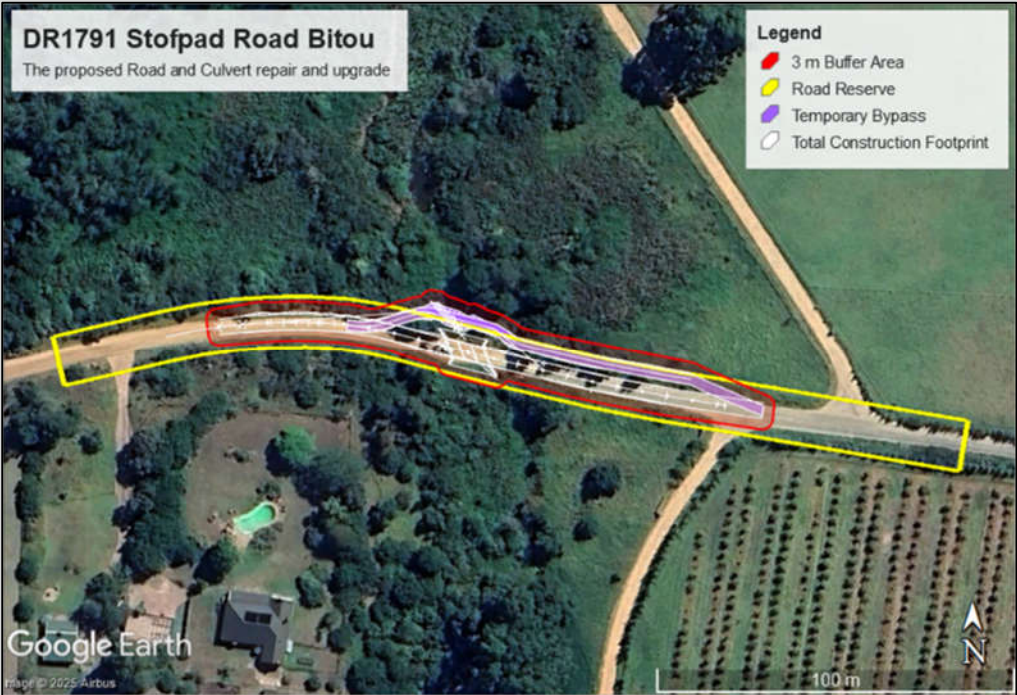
Proposed construction works of the by-pass infrastructure along DR1791, Wittedrift (downstream).
